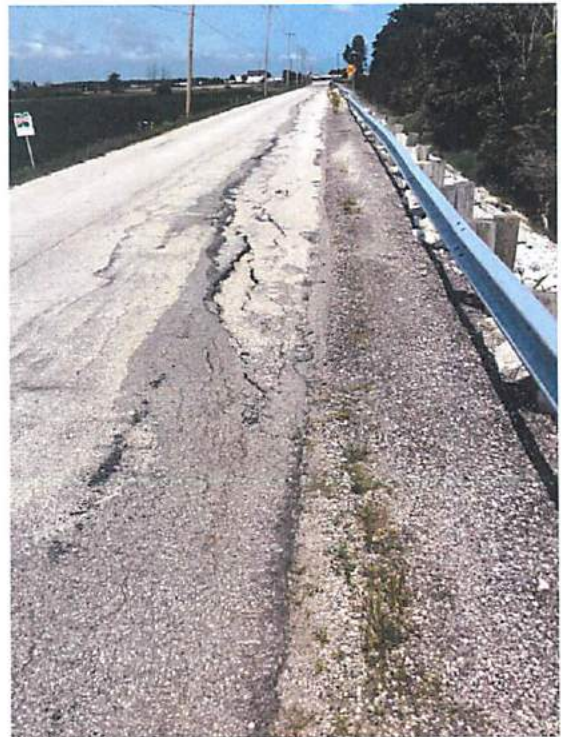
, 14, 15, & 16 – Pavement Failure and Settlement of Edge Repairs
